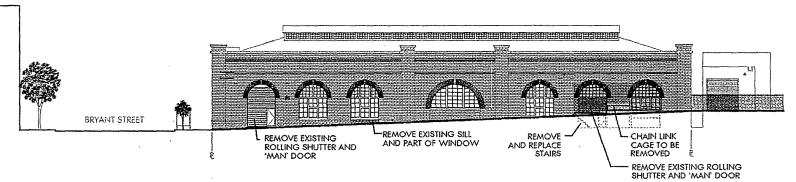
(a) – Existing and Proposed Elevations (South – Alameda Street Side)
